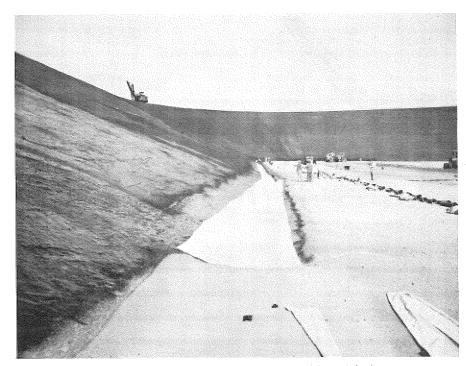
West toe drain ditch after placing fabric reinforcing.
